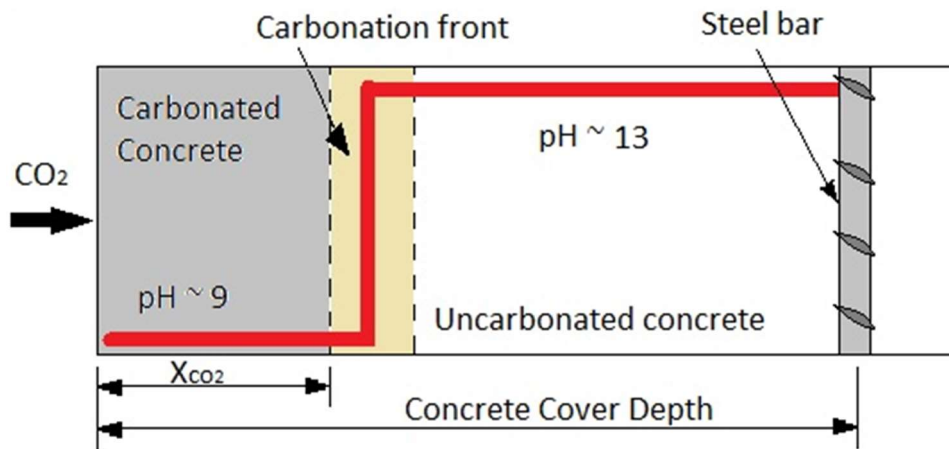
Degradation zones of a carbonated concrete structure (Ta et al., 2016)
